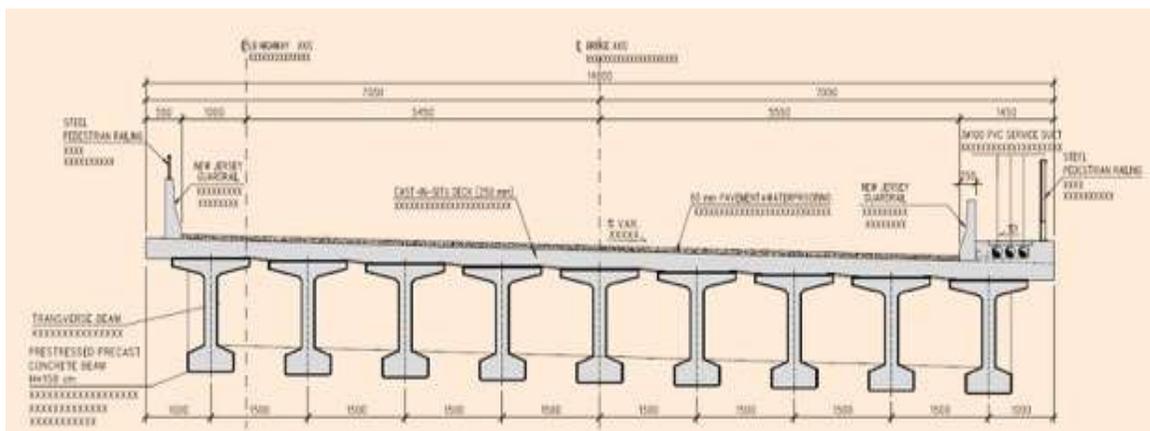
Typical Cross Section of Main Road Bridges
